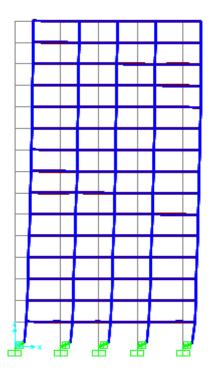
Deformed shape of base isolation structure from ETABS window
